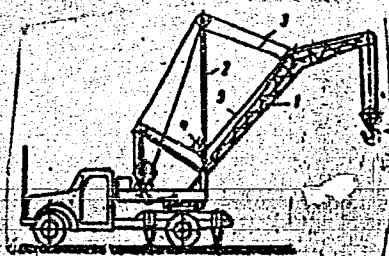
1 - boom; 2 - strut; 3 - boom pulley system; 4 - diverting pulley; 5 - load cable.
